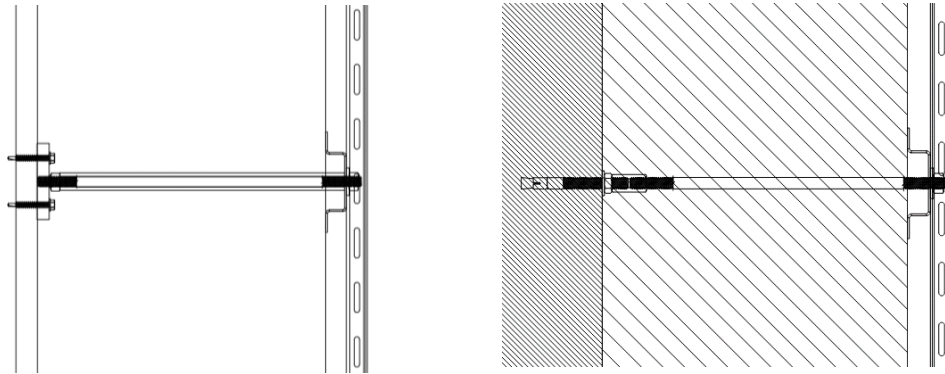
Wind load anchor for steel stud backup wall (left), and for concrete backup wall (right)
